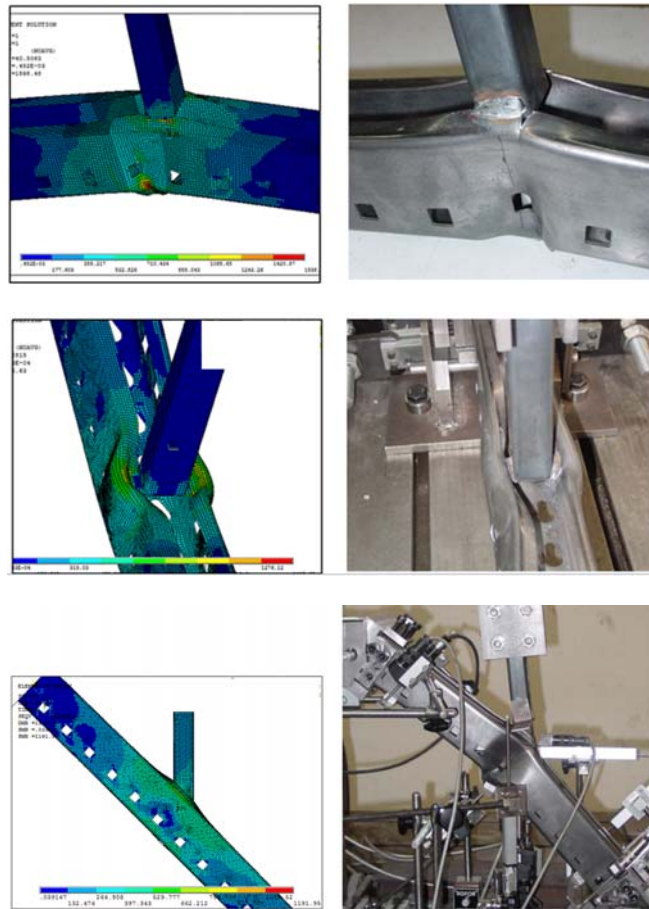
Test fixtures, views of failed specimens and finite element modelling
